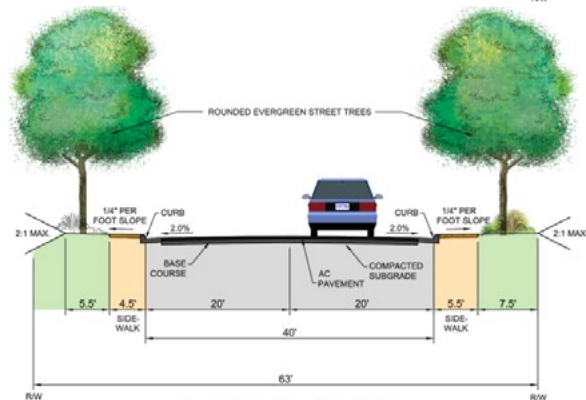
FLORIDA AVENUE AND CALVERT AVENUE STREET SECTIONS
